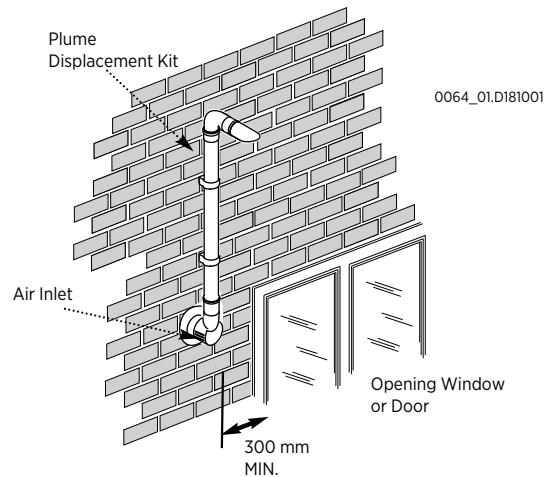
Installation Position of Plume Displacement Set to Window or Door
